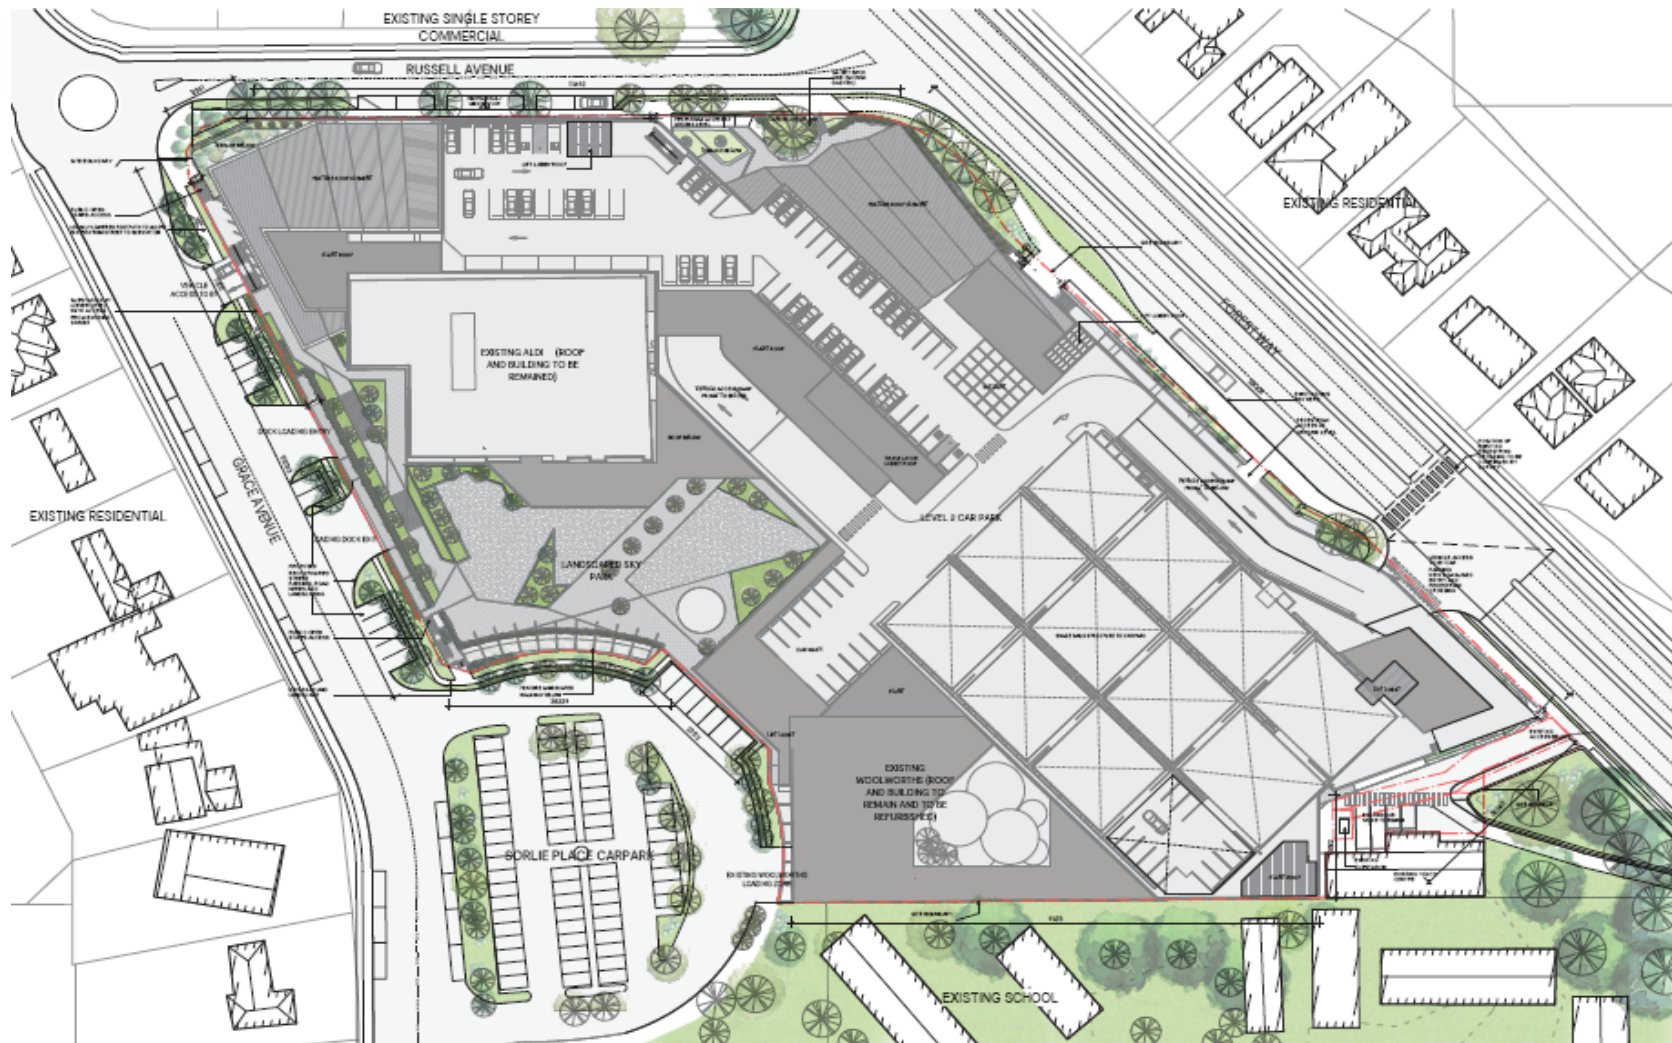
First Floor Plan of the proposed alterations & additions to the existing Shopping Centre.
